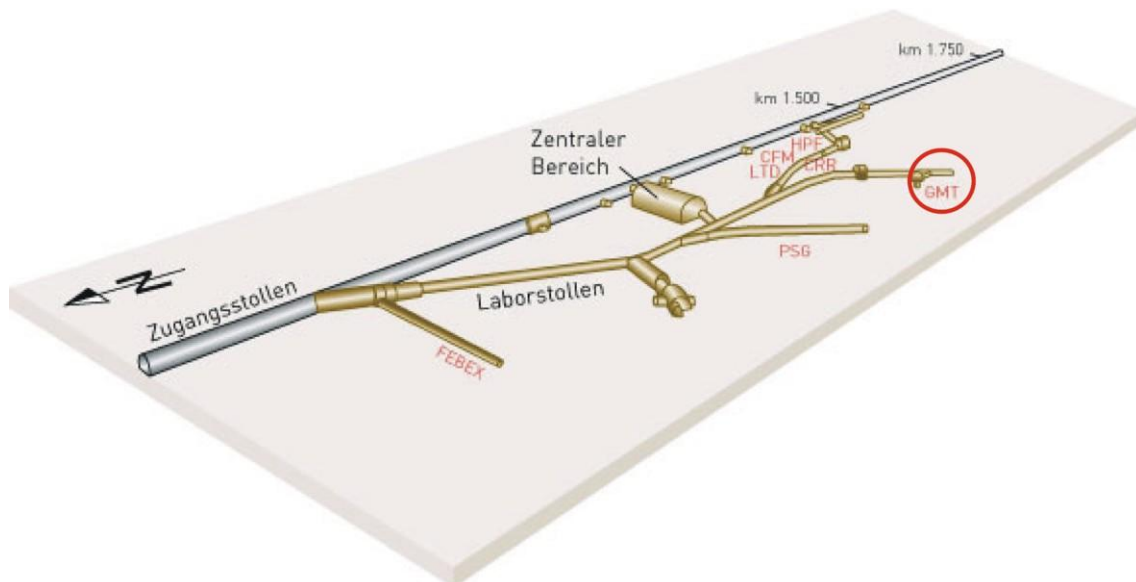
Location of the full-scale test at VE tunnel.
